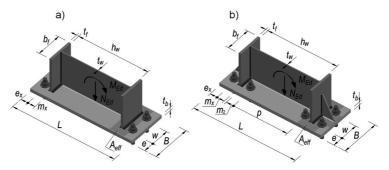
Analyzed column bases: a) base plate anchored to the foundation by 4 anchor bolts, b) base plate anchored to the foundation by 8 anchor bolts
